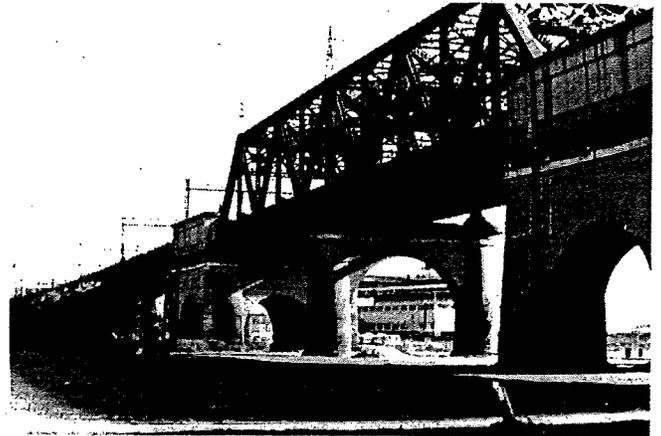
Little Hell Gate Bridge and rail line crossing Bronx Kill and Randall's Island Park.
